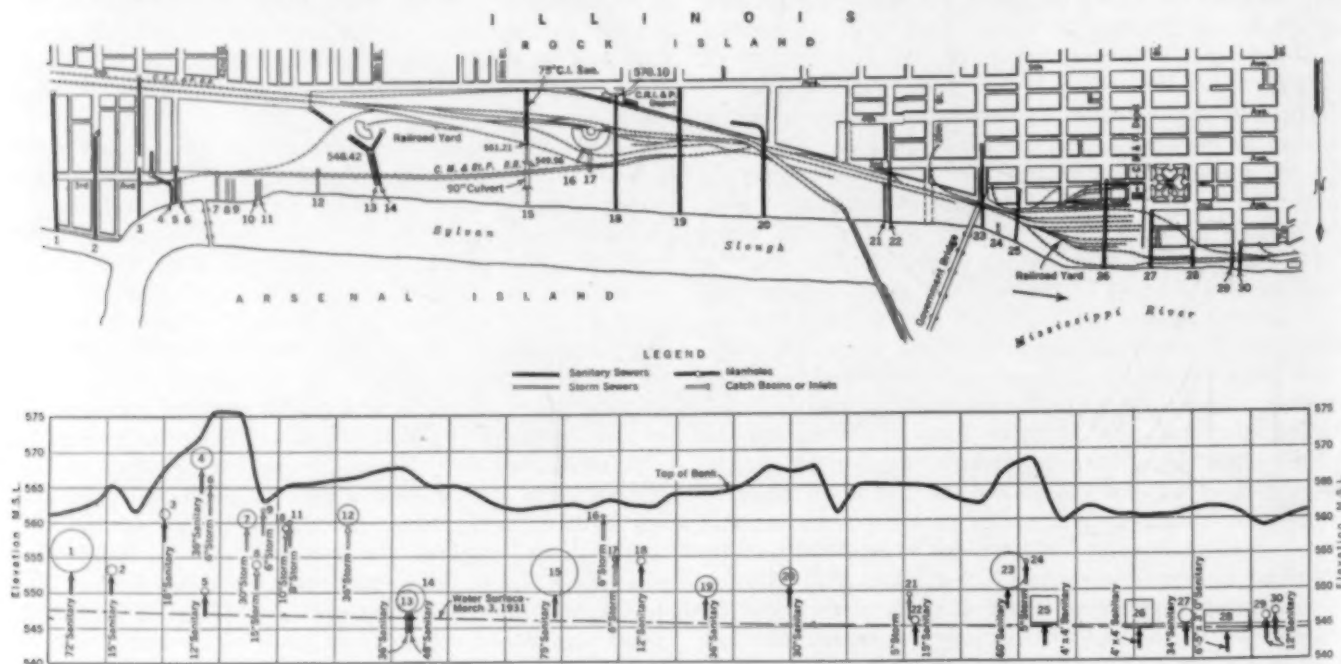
PLAN AND PROFILE OF SEWER OUTFALLS AT ROCK ISLAND, ILL.
